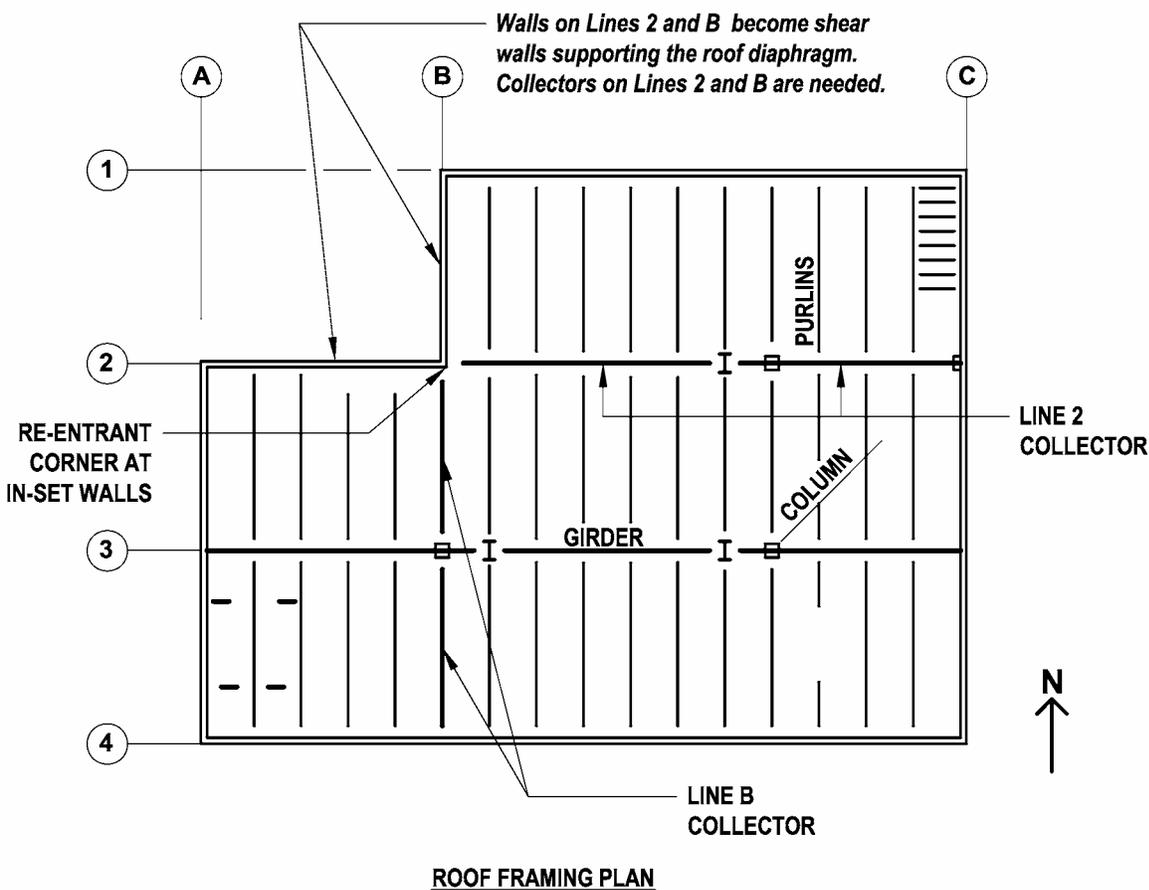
Plan of PC1 Building with Re-entrant Corner at In-set Panels
